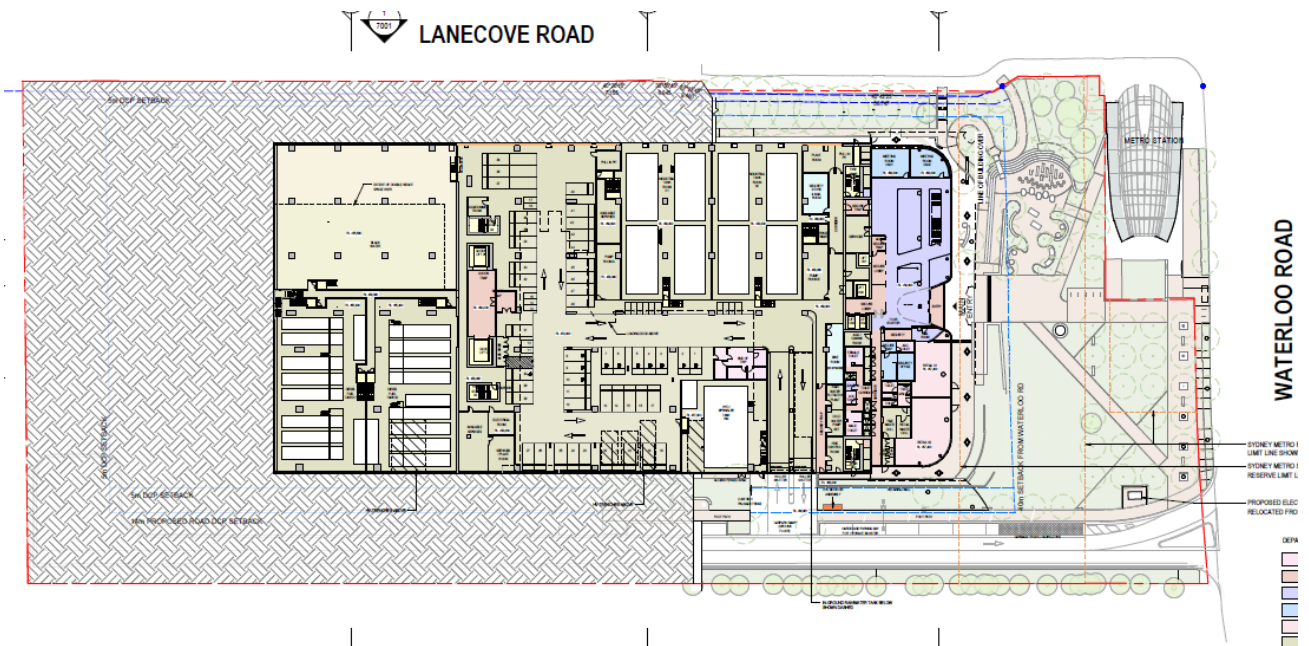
Proposed Ground Floor Plan. Source: HDR – August 2025
